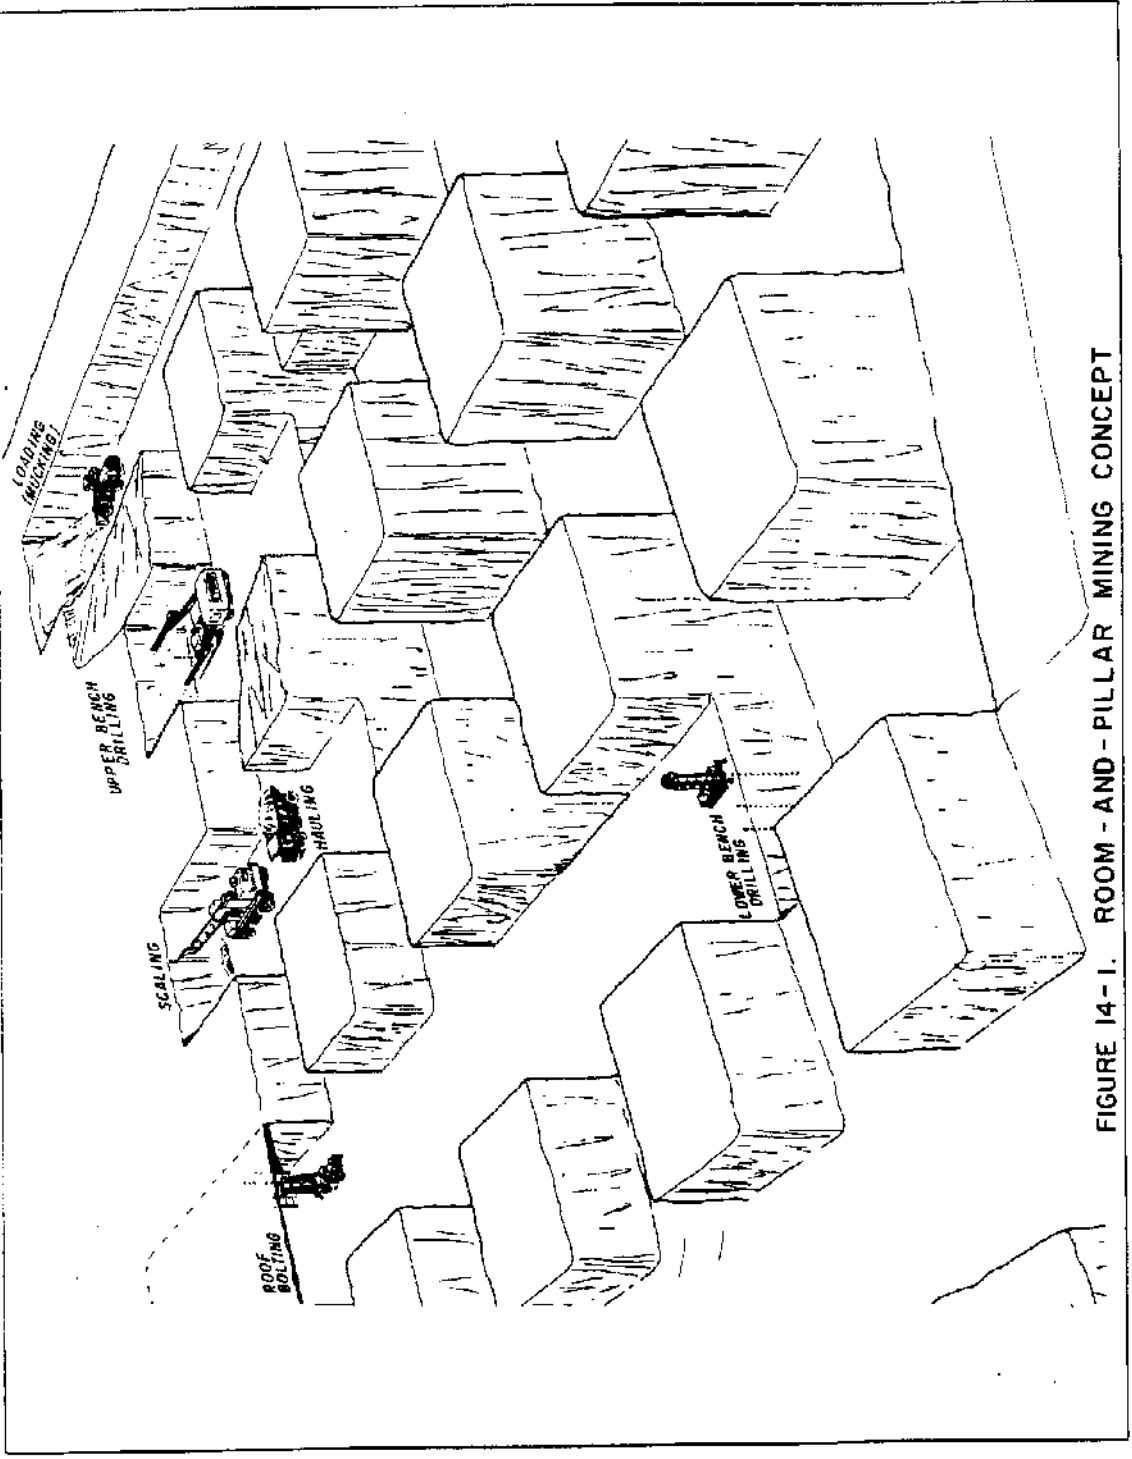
ROOM - AND - PILLAR MINING CONCEPT
